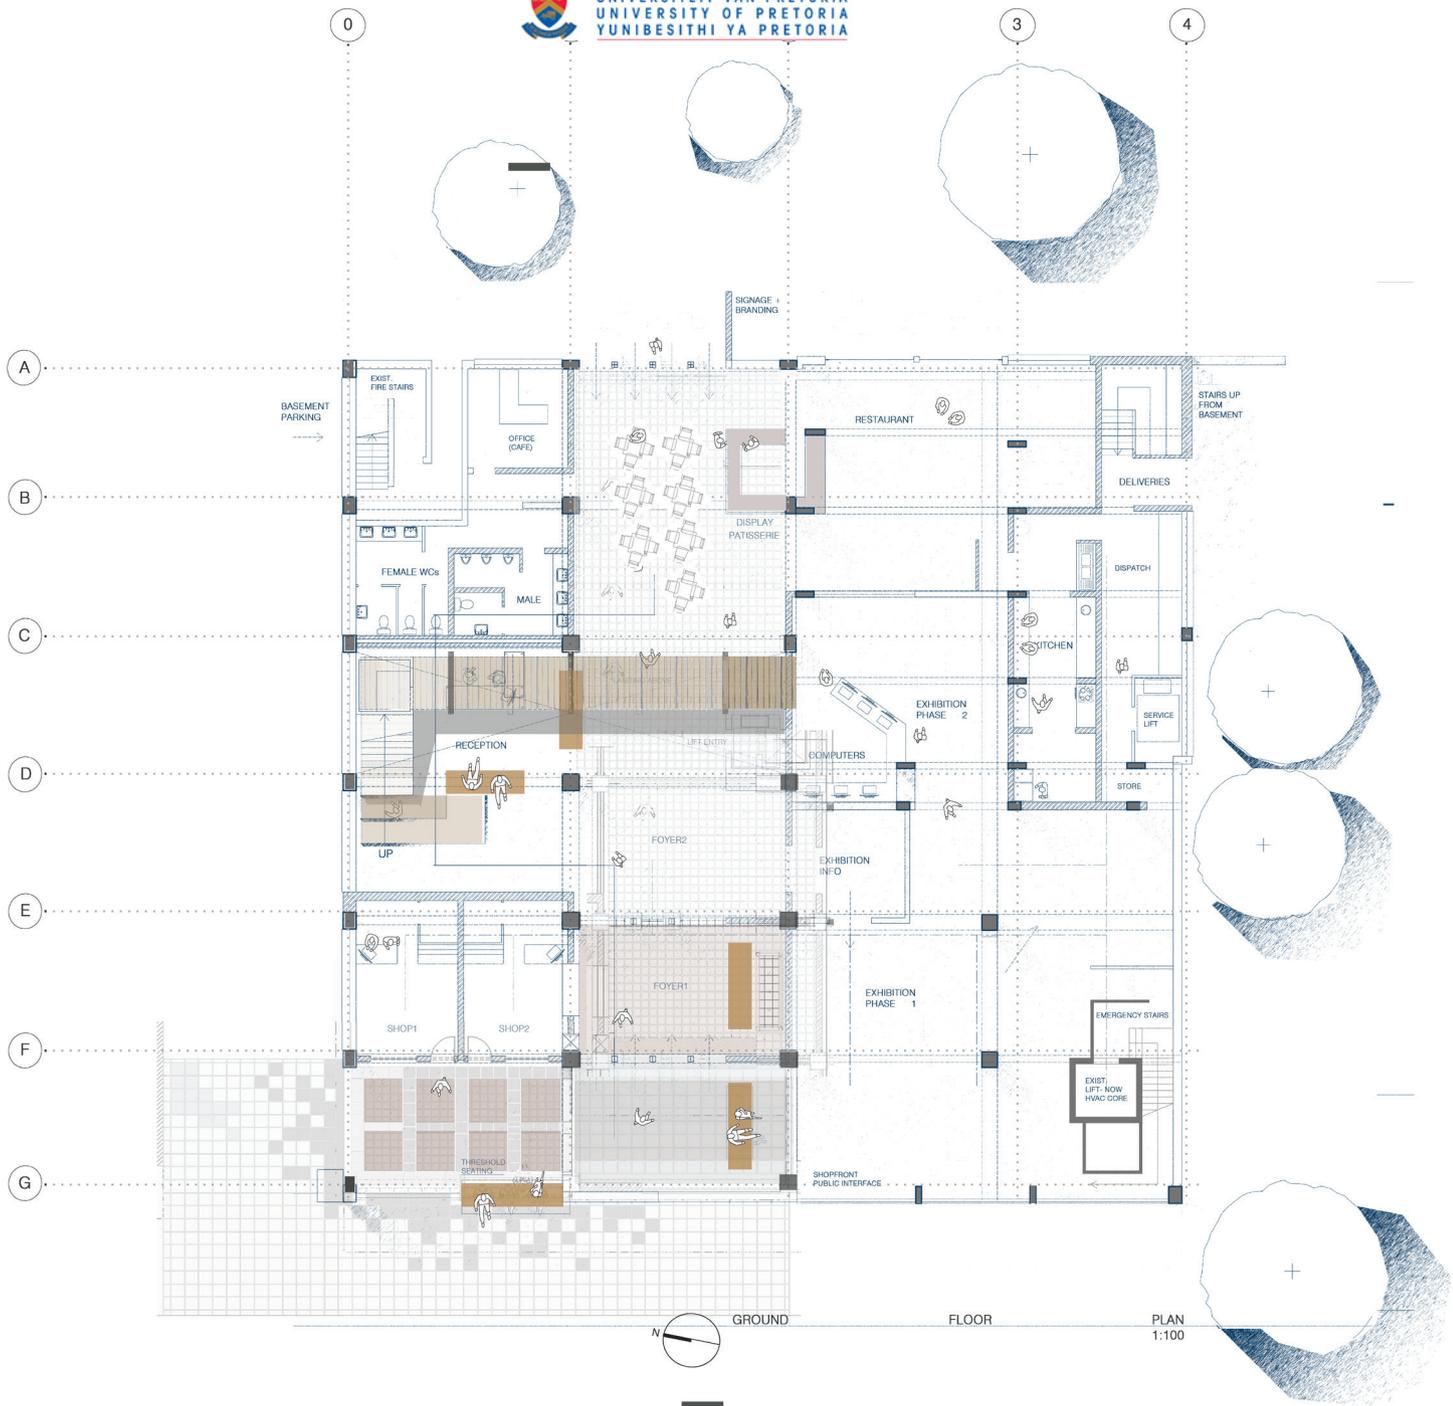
Ground Floor Plan- not to scale (Author, 2011).
